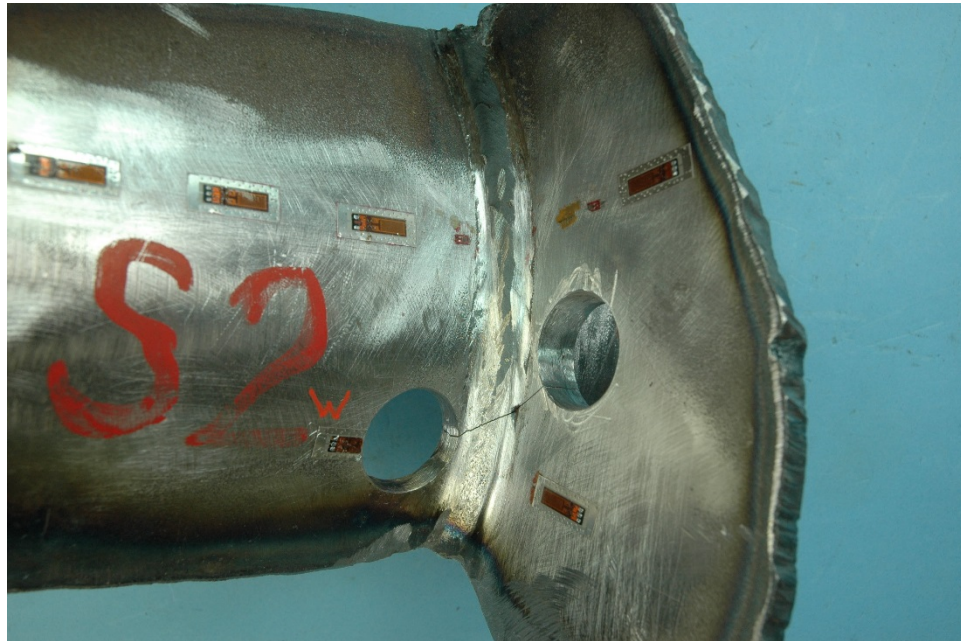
Portion of rib and floor beam containing the south side crack cut out of the mock-up specimen MU2
